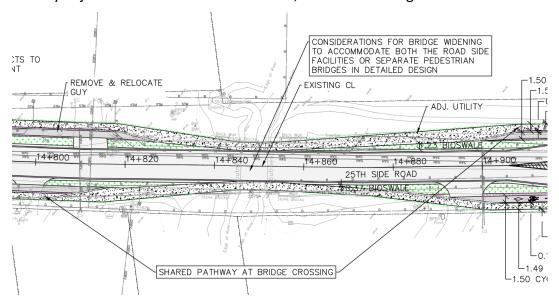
Bridge crossing on 25th Side Road south of Pinegrove Ave
